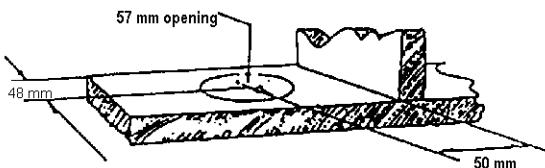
The pipe runs should be installed when framework is up, but before your walls are plated. Start on the top floor and drill a small hole in the ground beam under the inlet valve. Check for obstructions. Then drill a 57 mm hole through the ground beam. Centre of the hole should be positioned as shown in fig. 8.1
